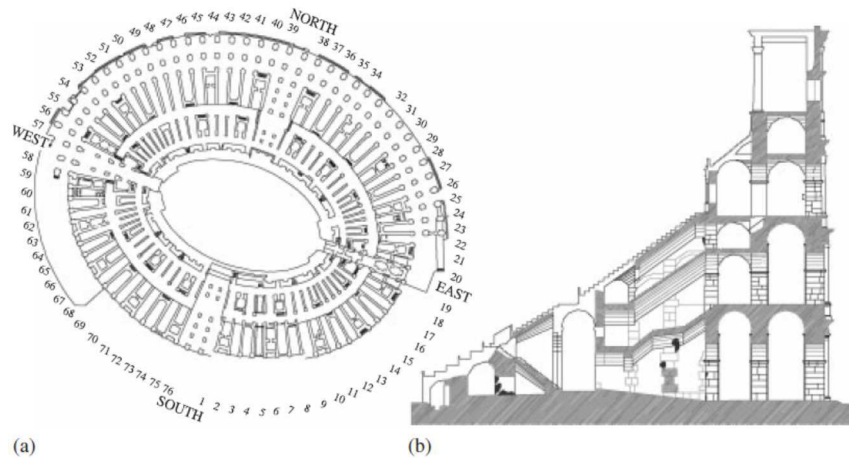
a) Plan and b) radial section of the Coliseum [Pau & Vestroni 2008]
